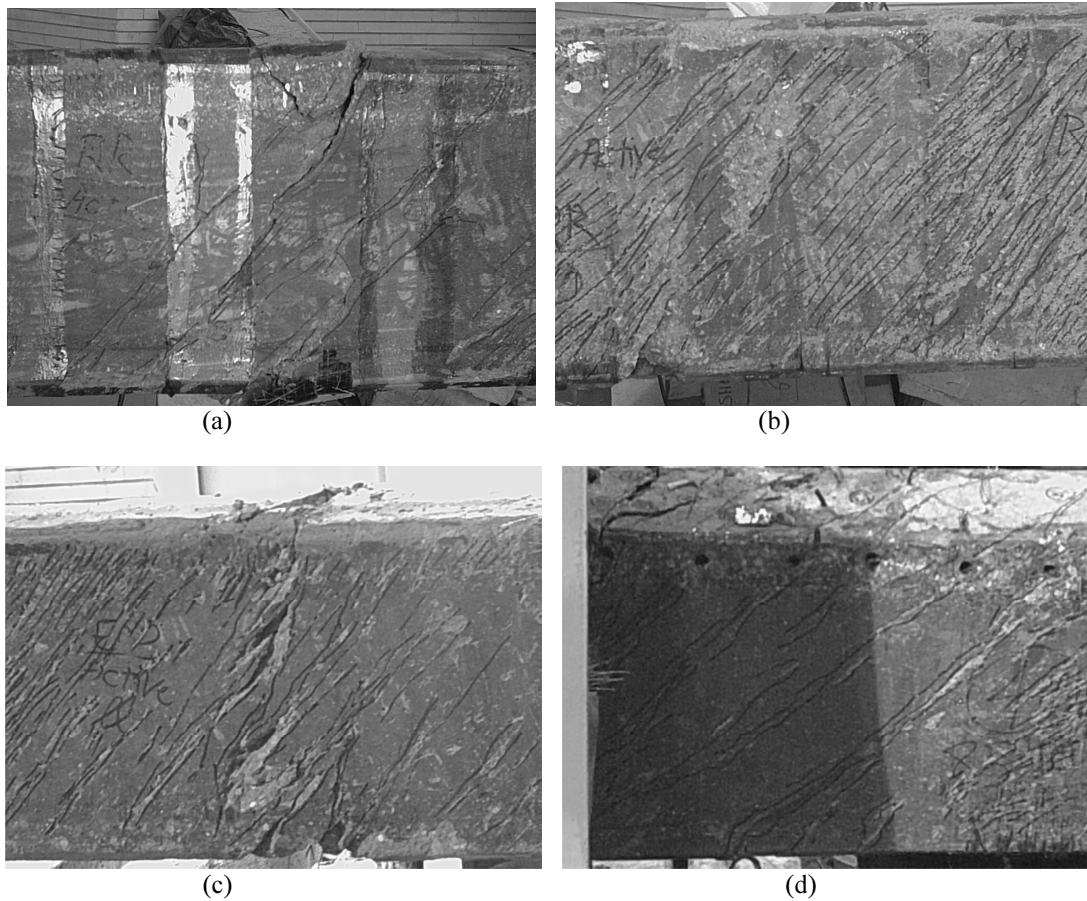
The crack distribution in the strengthened specimen beams: a) Specimen CS1; b) Specimen CW1; c) Specimen CW2; d) Specimen CUJ-anc.
